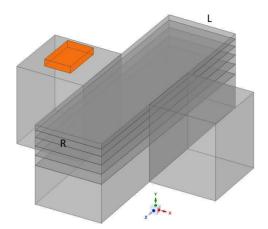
overview of pavement model. Pavement in grey, wheel in orange.
